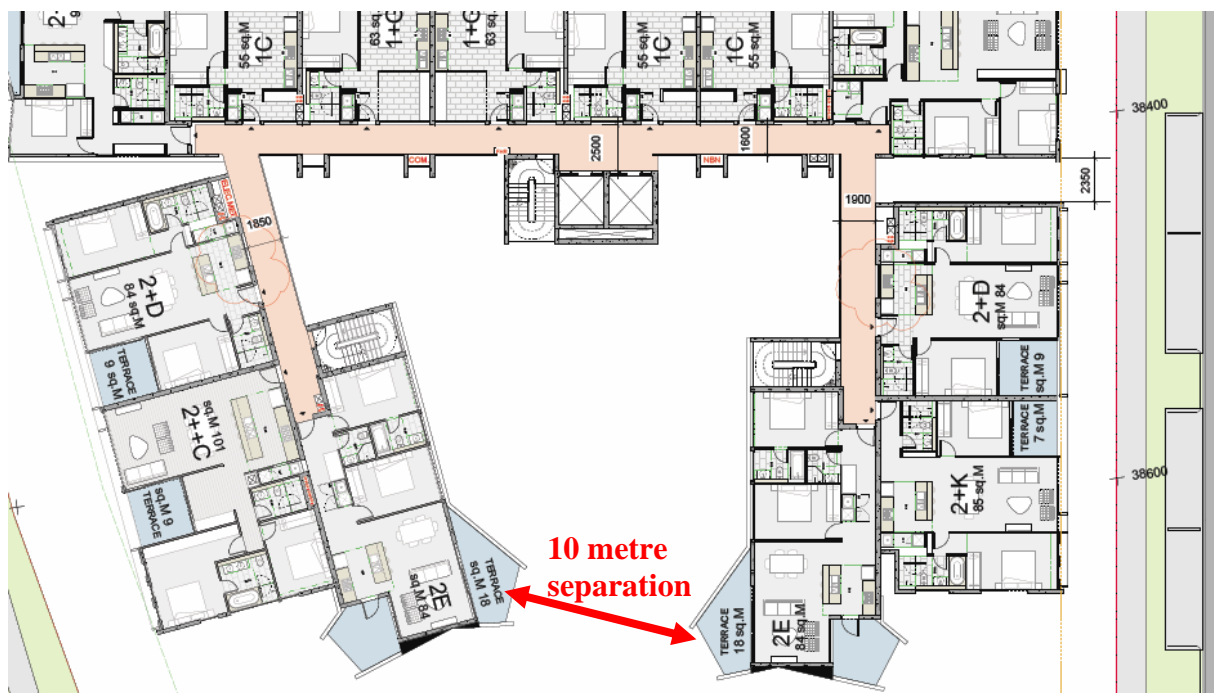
Extract of central building plan for levels 1-3. The non-compliant separation between east- west facing balconies is highlighted.
